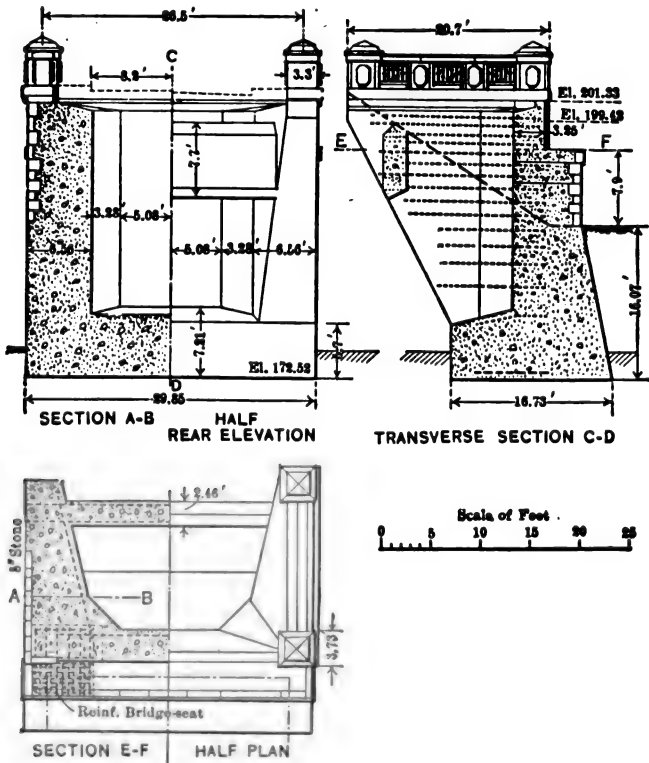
CANTILEVER ABUTMENT. CANAL FROM DATTELN TO HAMM.
